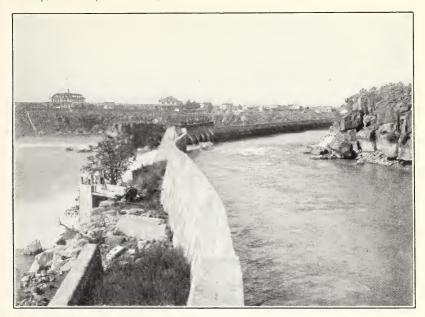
Concrete Retaining Wall, North Side of Twin Falls Canal.
